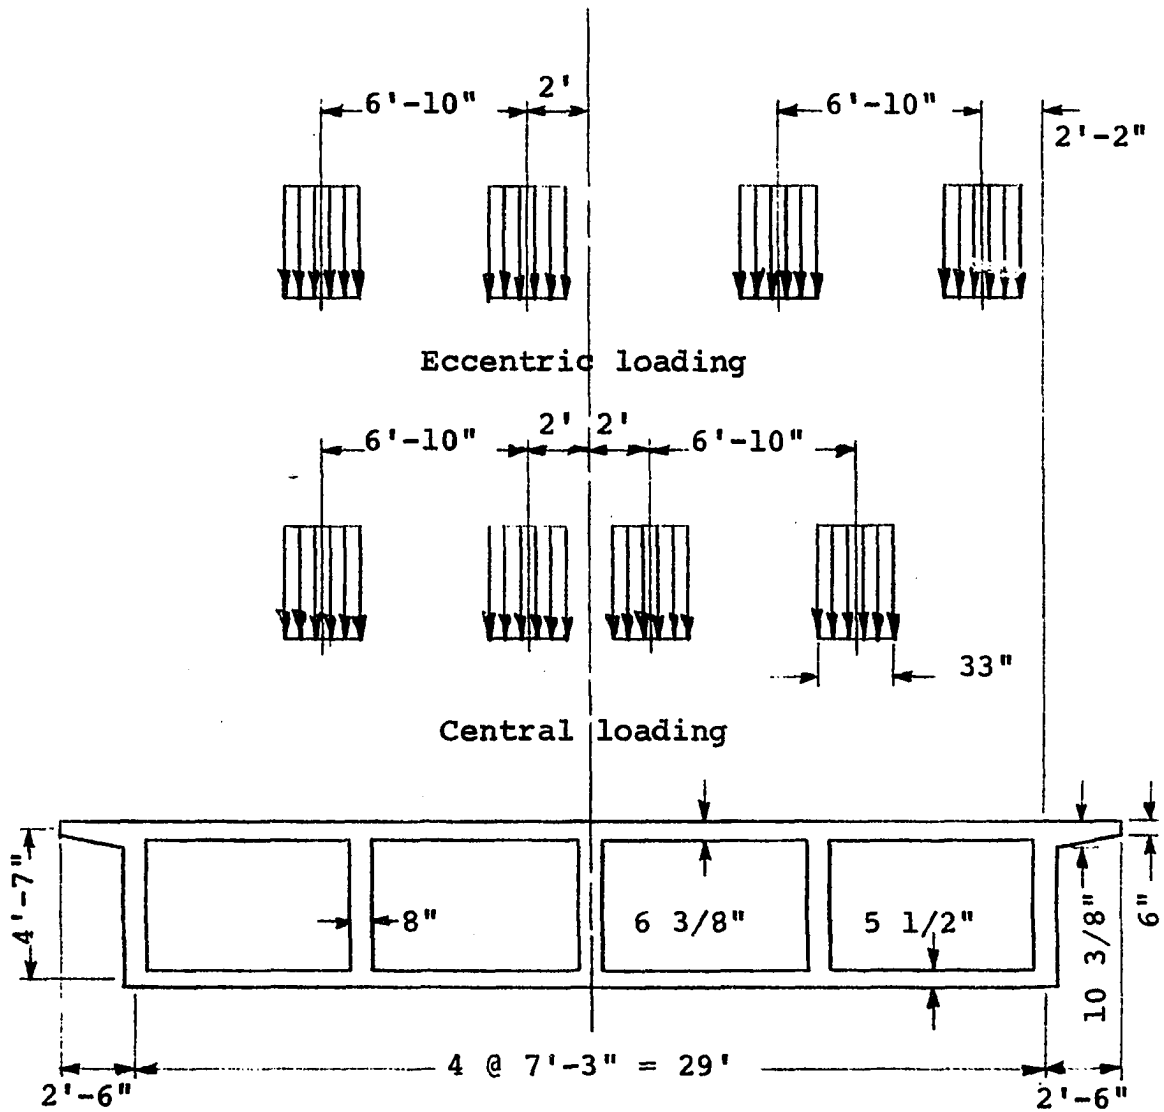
Cross-section and loading patterns, Harrison Street Undercrossing
